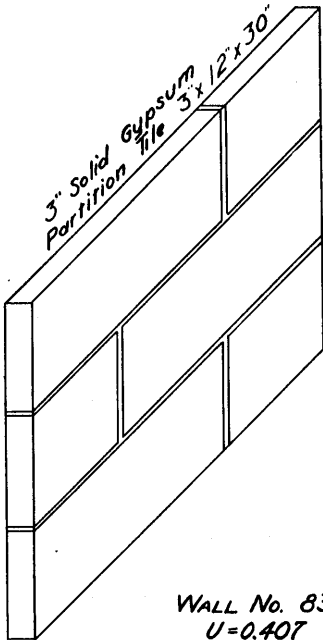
SECTIONAL VIEWS OF TEST WALLS
